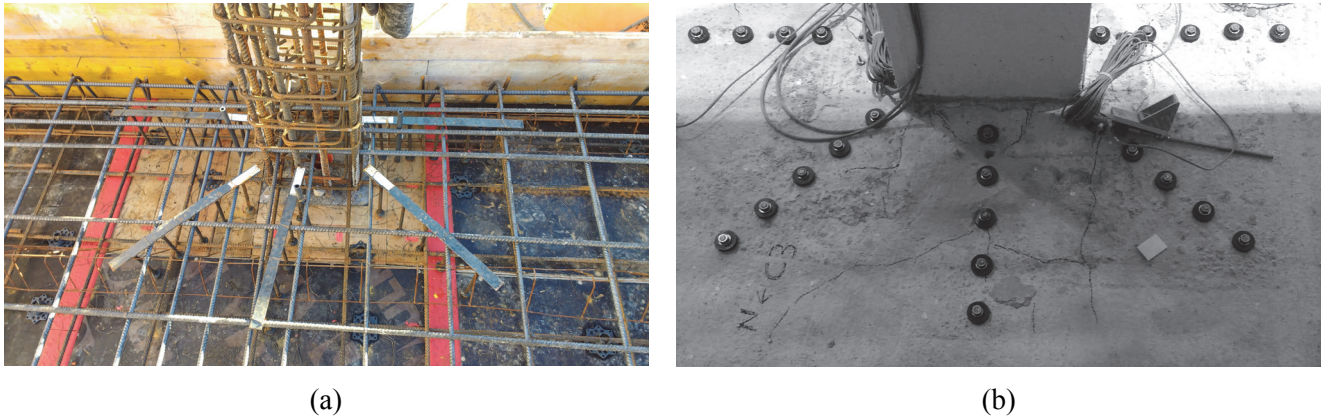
Shear reinforcement on edge columns: a) pre-installed at 2<sup>nd</sup> floor and b) post-installed at 1<sup>st</sup> floor
